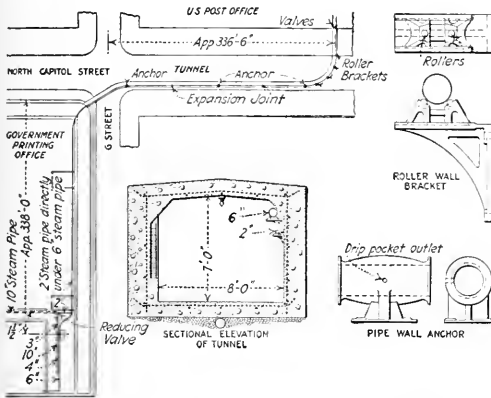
DETAILS OF TUNNEL CONSTRUCTION AND WALL BRACKETS
